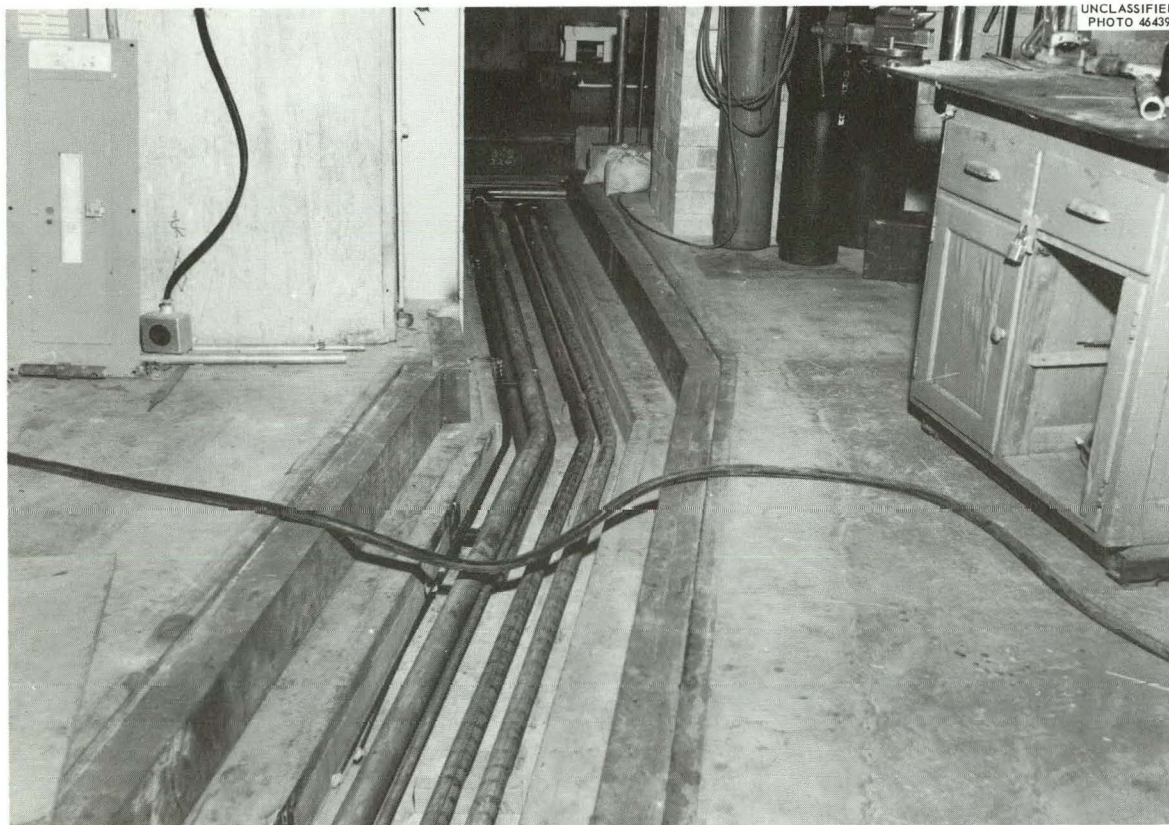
Pipe Trench Facing Pressurized-Water Loop Equipment Cubicle.
